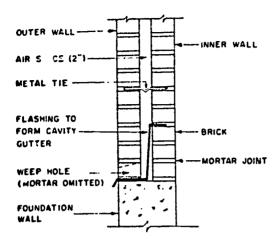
Typical Flashing Installation at Bearing Support of Cavity Wall.
